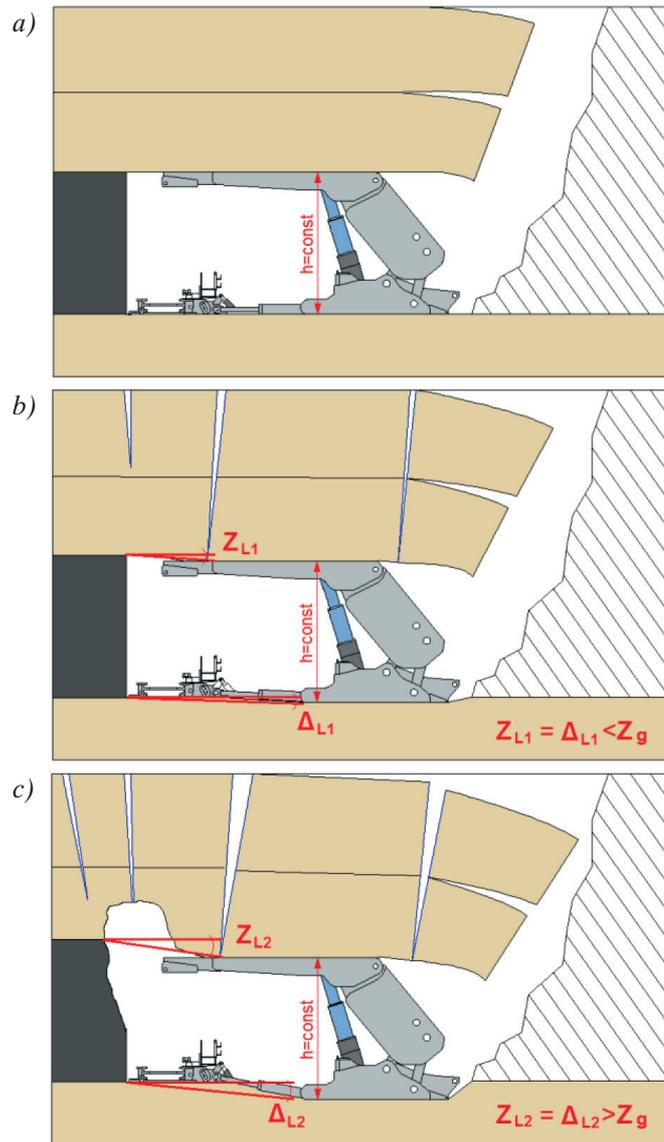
The longwall ceiling maintenance: a) properly maintained ceiling; b) good ceiling conditions, unit inclination lower than the ceiling boundary inclination; c) deteriorated maintenance conditions of the ceiling, unit inclination greater than the boundary inclination [1]
